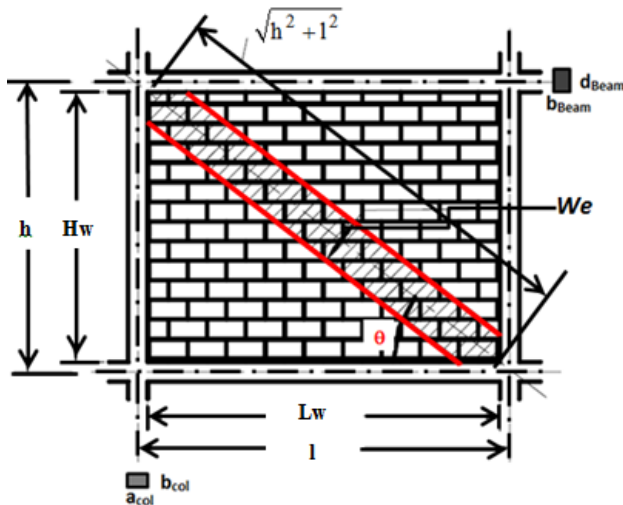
Equivalent Strut Model for Masonry Infill Walls in Frame Structures
